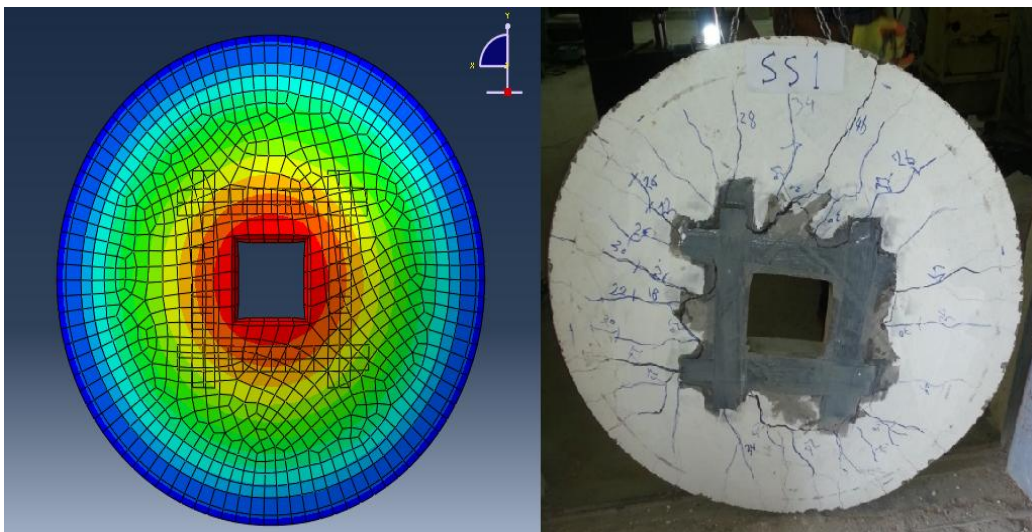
Plastic Strain and Crack Pattern for Slab (SS1) at Failure
